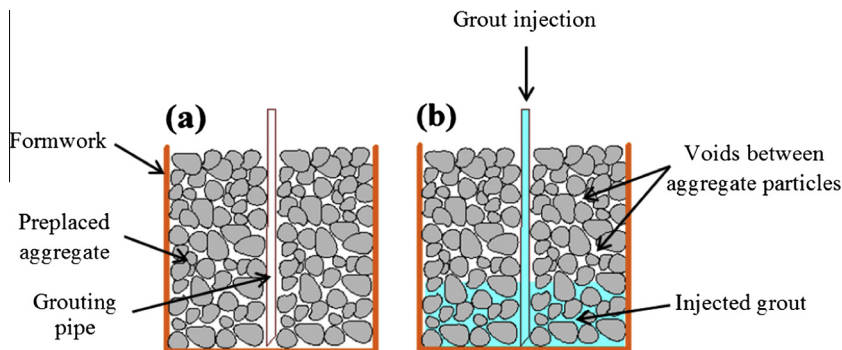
TSC grout pumping process: (a) coarse aggregate placement and (b) grout pumping through pipes.
